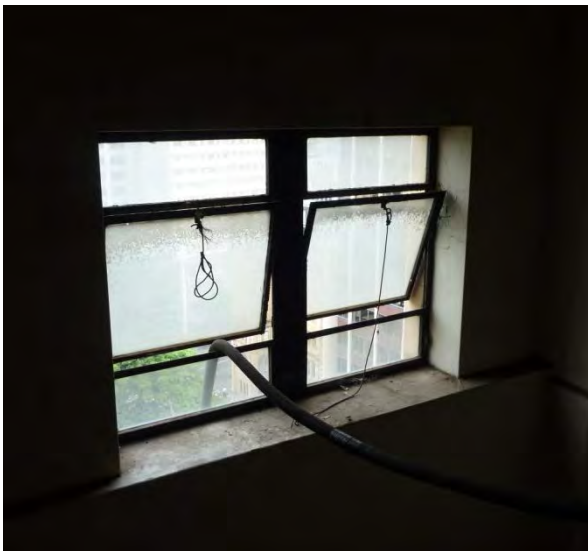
Original windows in the Carrington Street fire stairs of the former Shell House. (Source: GML 2014)
